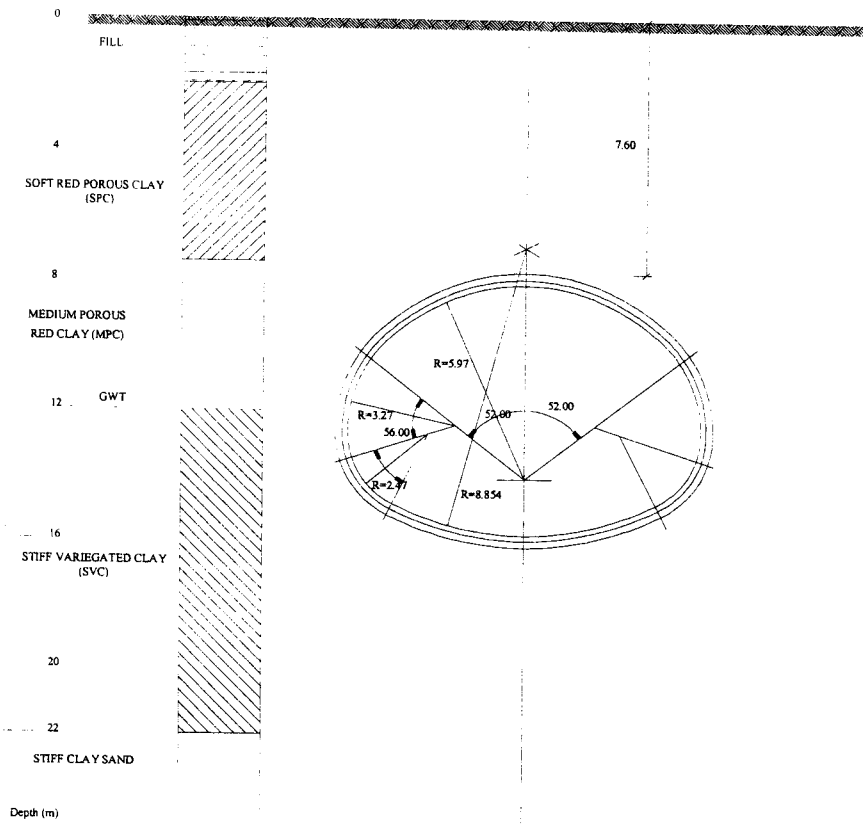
Paraiso tunnel cross-section and geotechnical profile of the site
